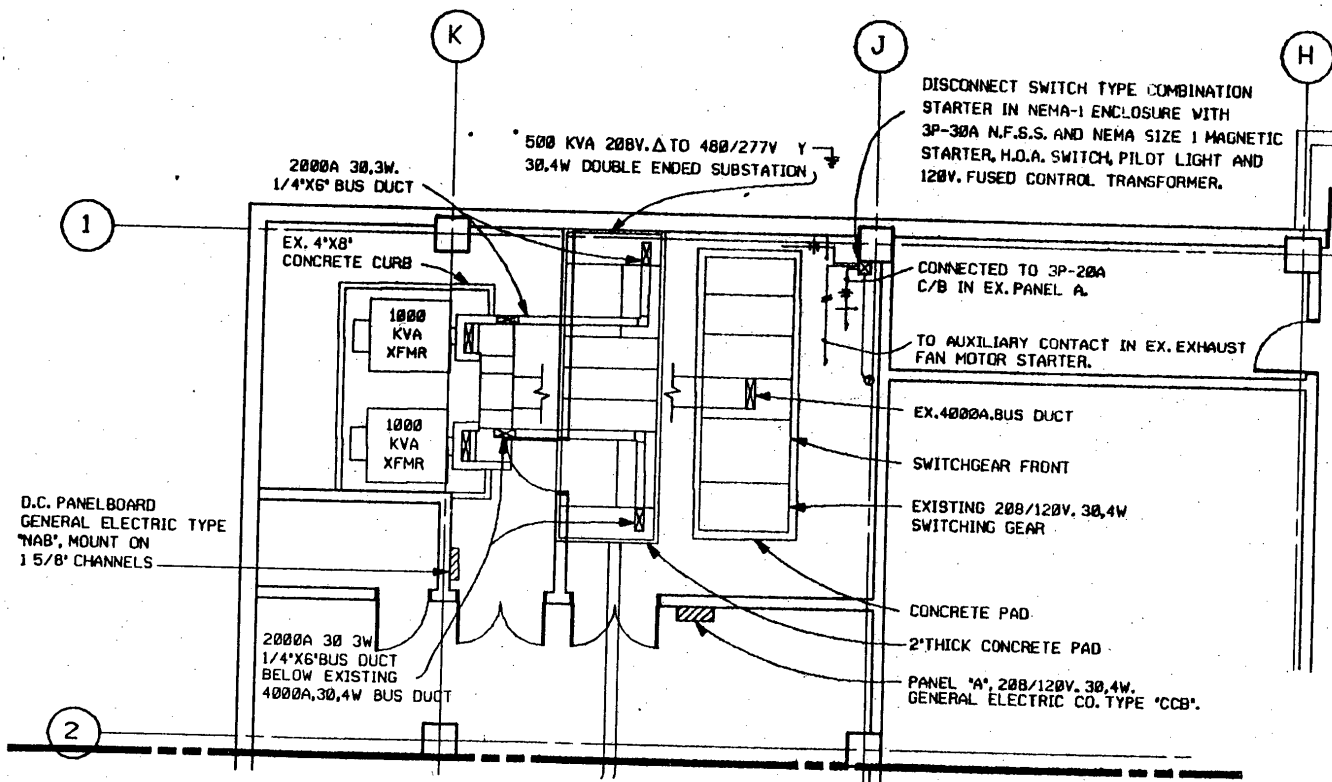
SWITCHGEAR ROOM G4 LAYOUT
